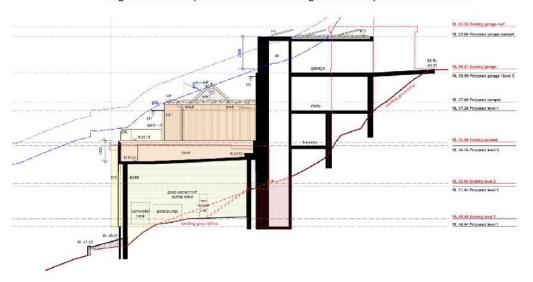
View of area breaching maximum building height control as noted in Section C prepared by Grove Architects
